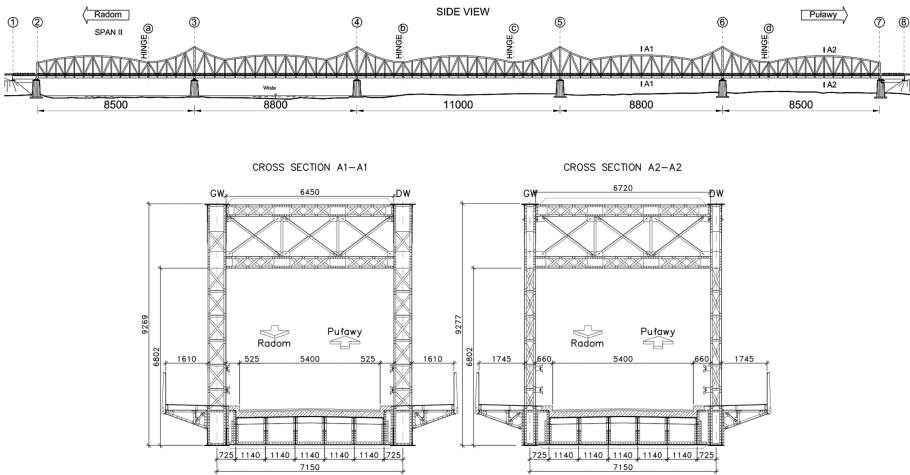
Structural form of the investigated bridge: (a) side view, (b) cross-sections
